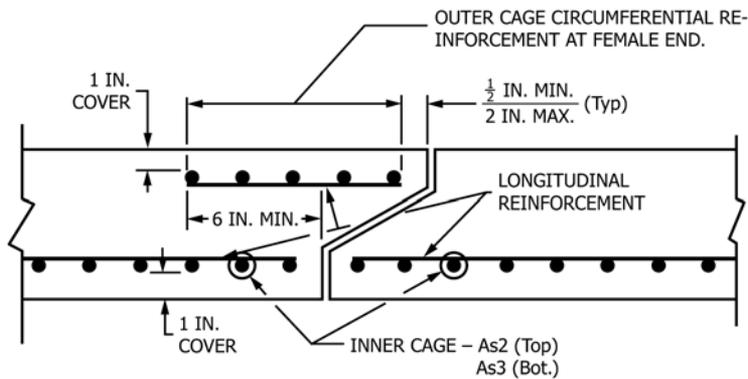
Section A-A Top and Bottom Slab Joint Reinforcement
